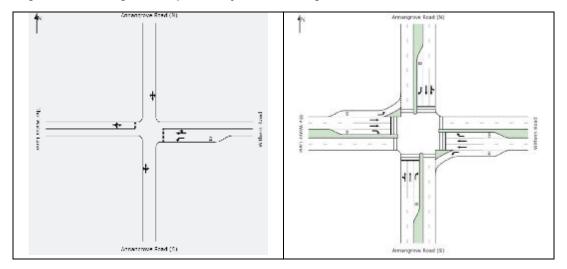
Existing and Proposed Layout at Annangrove Road/Withers Road Intersection
